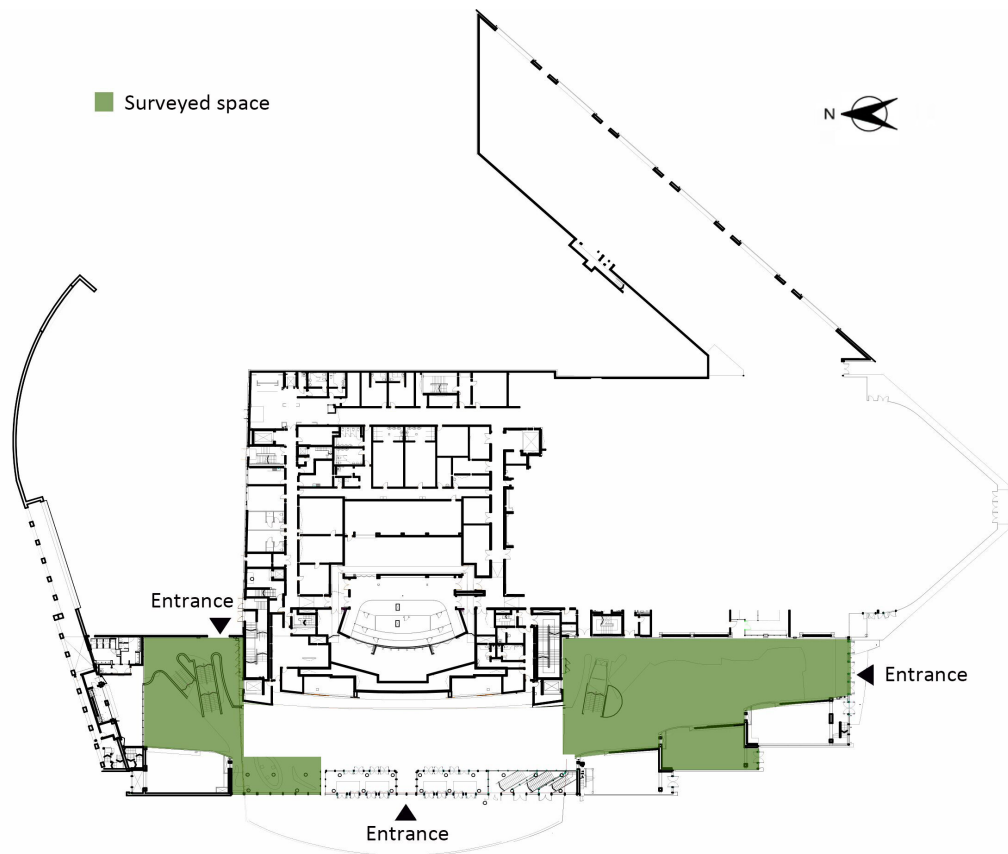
Floor plan of the case study building WMC's surveyed indoor transitional space.
